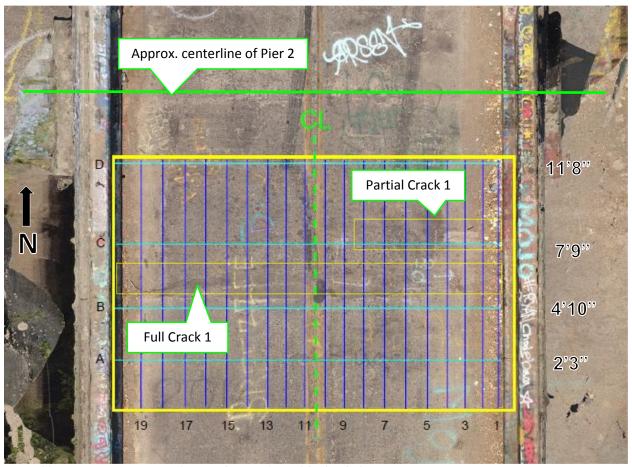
Approximate GPR scan lines at Abutment 1/Pier 2 bridge deck
